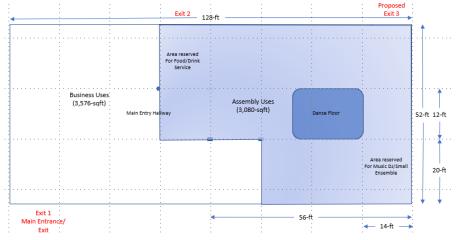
Second floor occupancy layout (mixed-use, unseparated)
